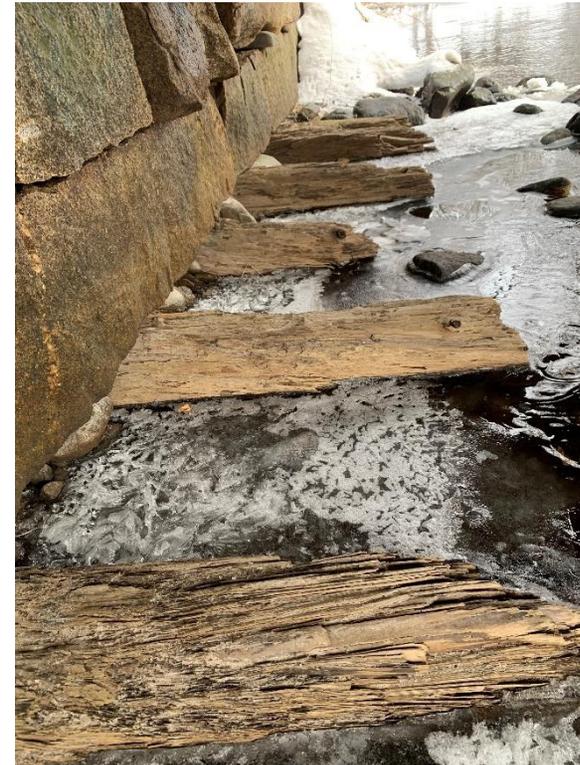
Facing west (upstream) along bottom of existing northern abutment with exposed timber piles
